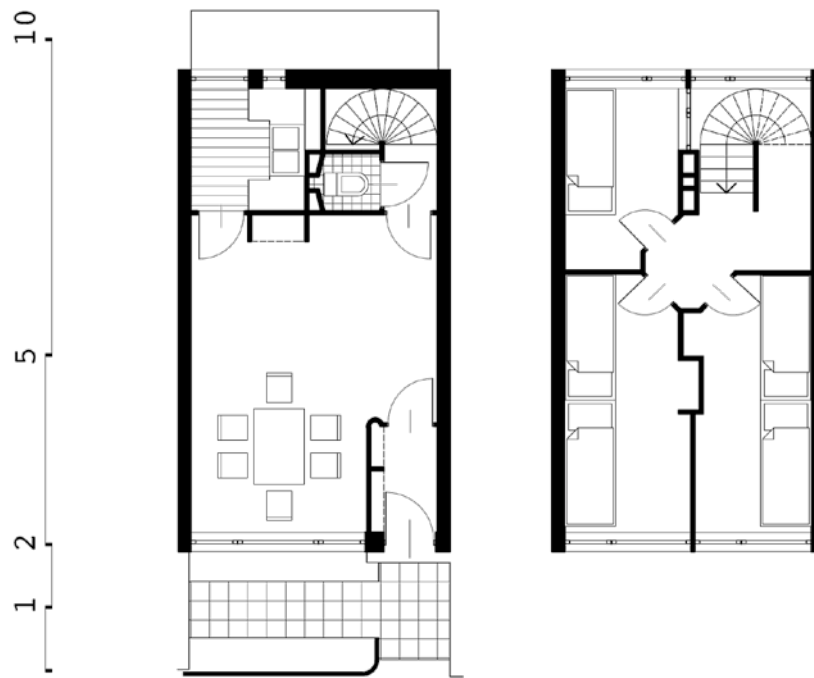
Plan of the house in Kiefhoek; source: own elaboration
